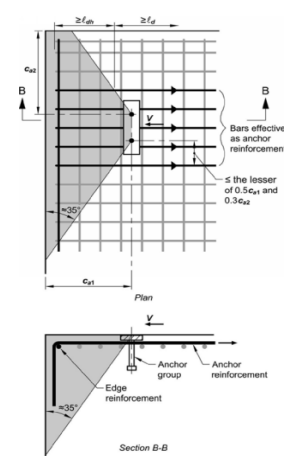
(b)—Edge reinforcement and anchor reinforcement for shear.
